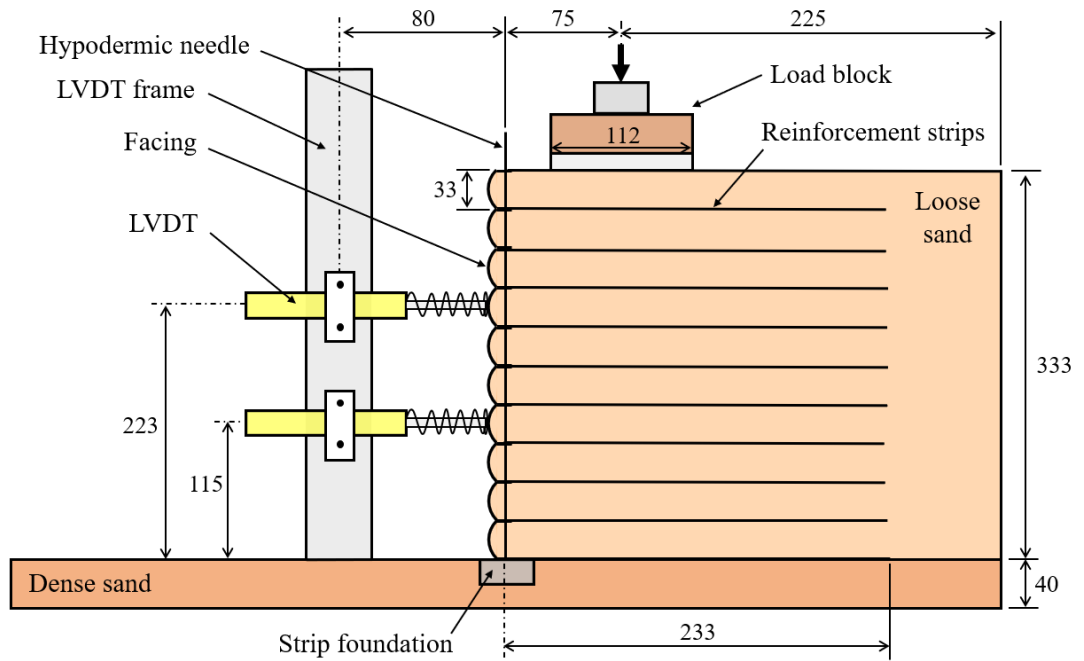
A cross-section of the load-displacement soil wall models. Not drawn-to-scale and all dimensions are in millimetres.
